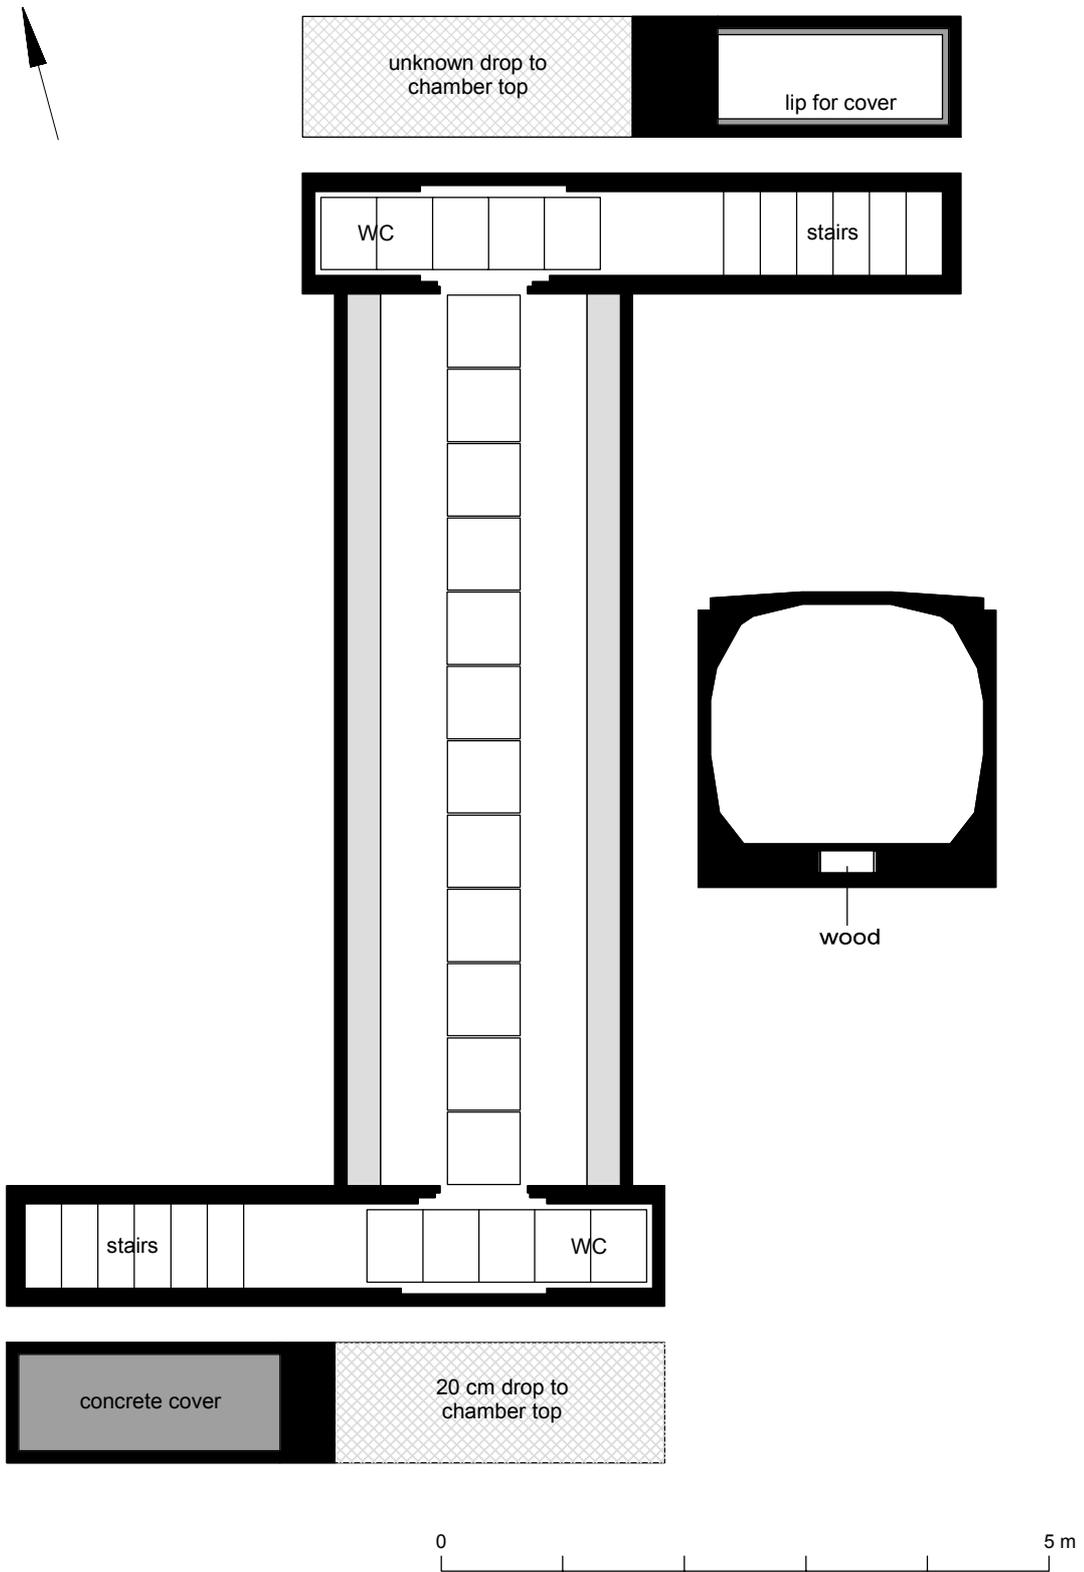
Area C2, air-raid shelter 1: internal plan and cross-section of chamber.
